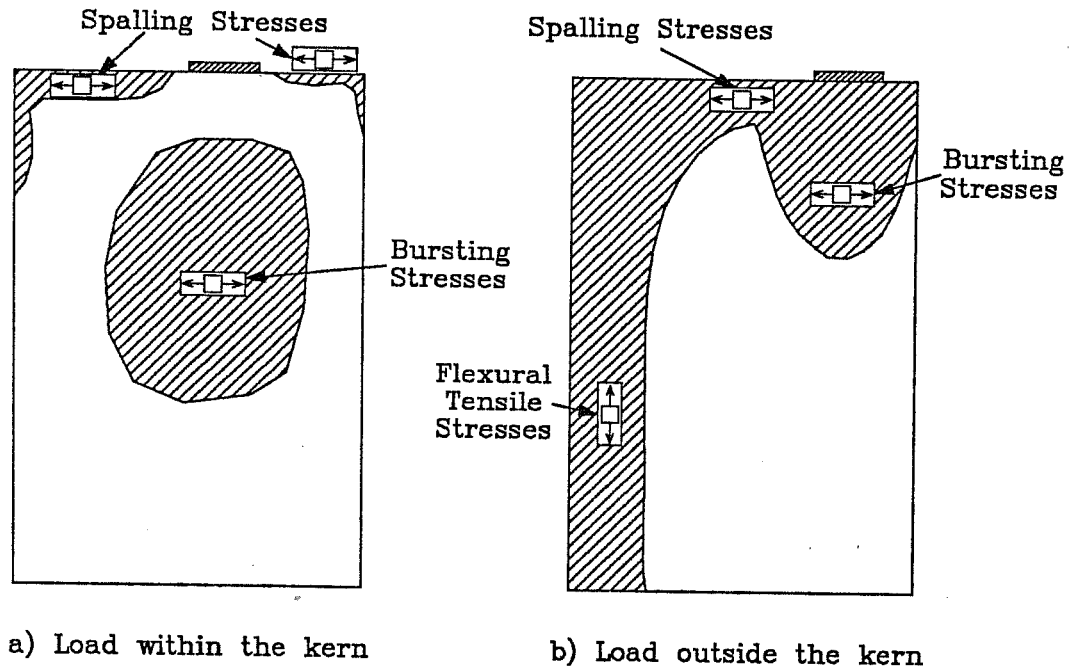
Areas of Bursting, Spalling and Flexural Tensile Stresses for Eccentrically Loaded Anchorage Zones
